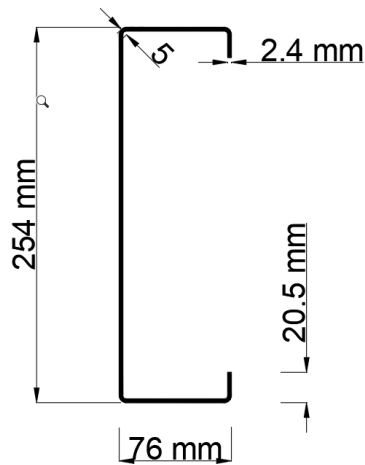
Cross-section dimensions of CFS C-section used in the test
